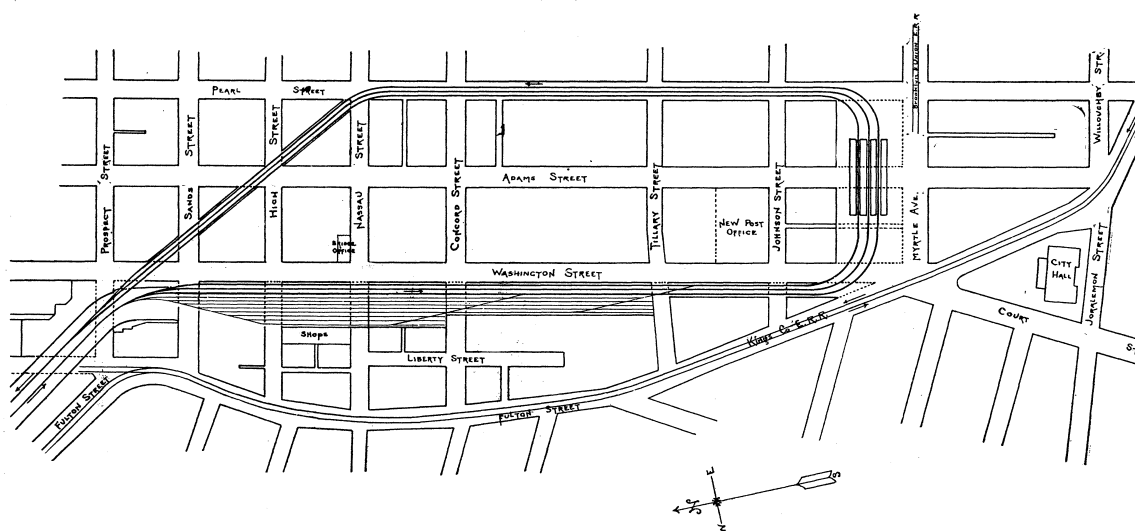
PROPOSED BROOKLYN TERMINAL, NEW YORK & BROOKLYN BRIDGE RAILWAY.
